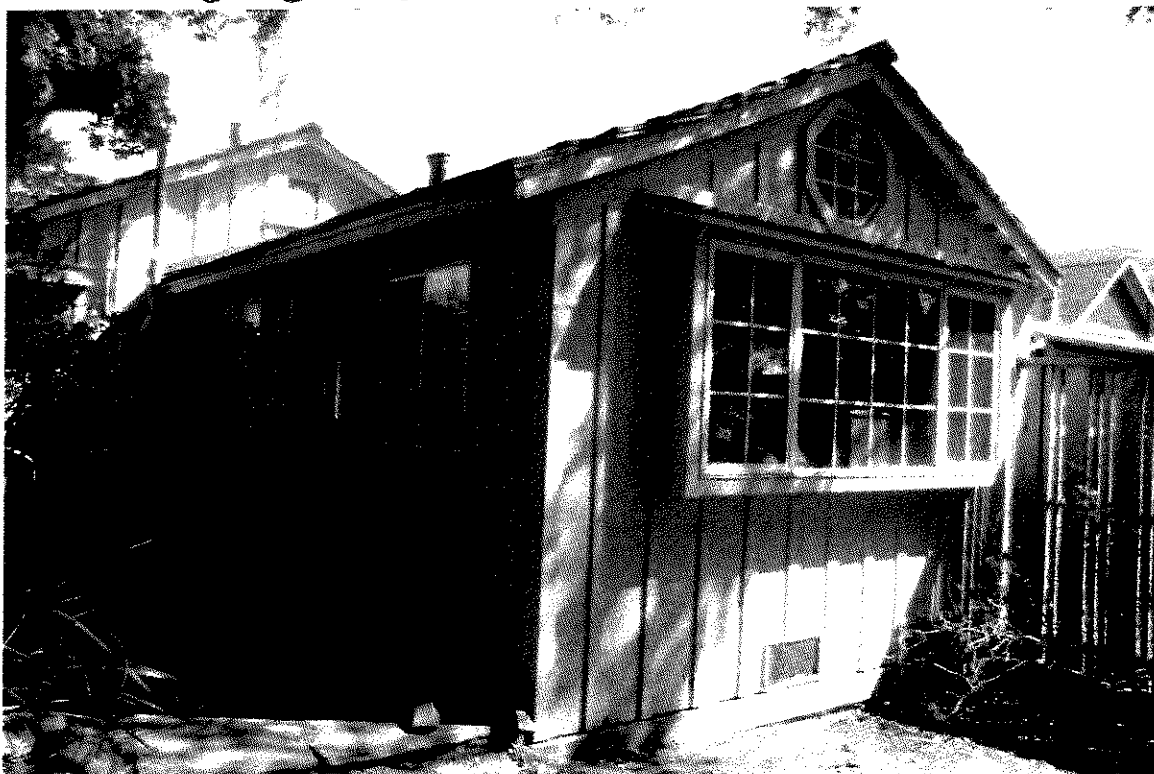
Looking NE at the south-side elev., and west facing facade. Note plastic snap-in muntins in all 1993 metal-clad windows, May, 2014.
